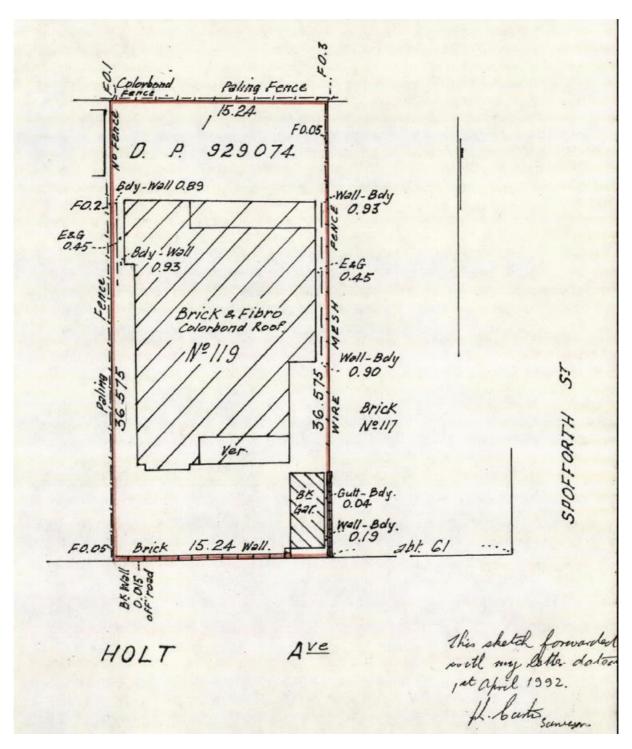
Survey sketch plan of 119 Holt Avenue, April 1992, by Robert L Curtis, surveyor. (Source: North Sydney Council, P339/119/9)
